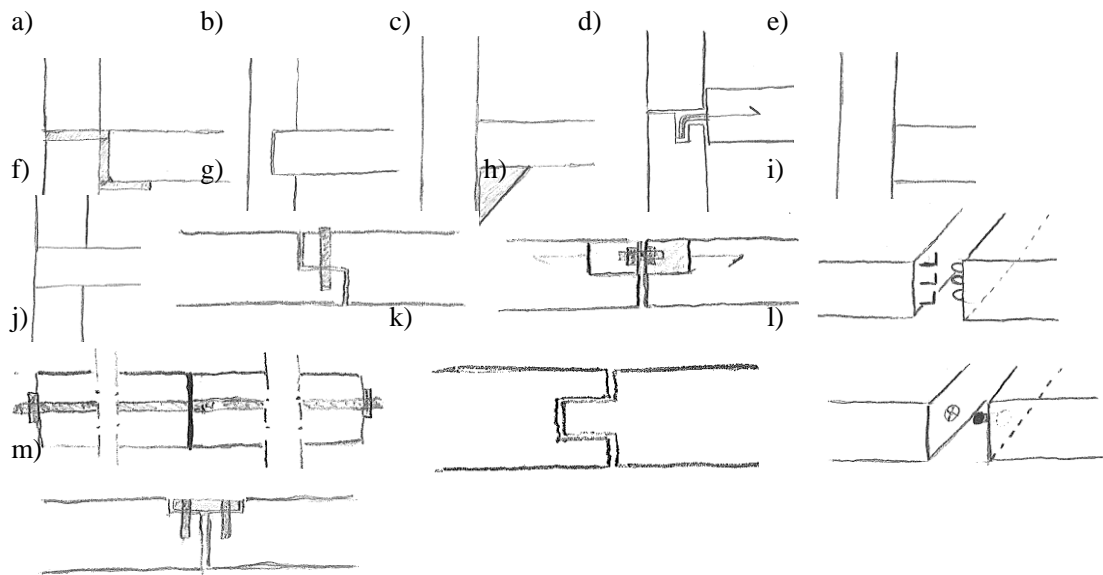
Connection devices invented in the brainstorming phase. a) z-profile b) Recess in element c) Cantilever support d) Hook e) Glue or Burdock f) Floor element between wall elements g) Bolted elements h) Screwed plates i) Hooked coils j) Post tensioned elements k) Recess in element l) Click connection m) Bolted steel plate.
